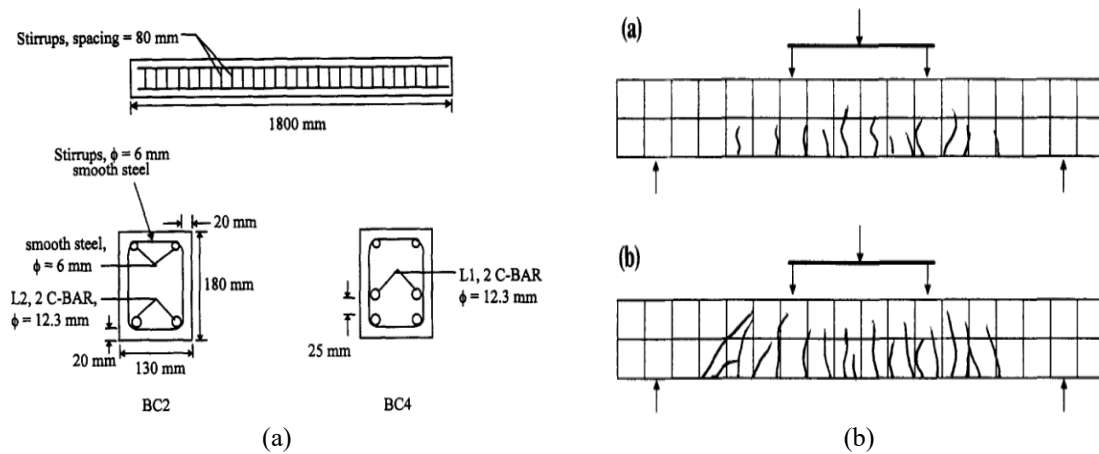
(a) Details of reinforcement and test specimen and (b) Cracking Pattern In BC4 and BC2 Specimen (Theriaule and Benmokrane 1998)
